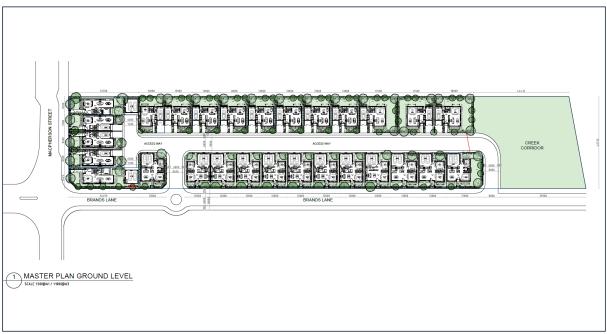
Proposed Masterplan ground floor level plan extract (Source: PBD Architects)
